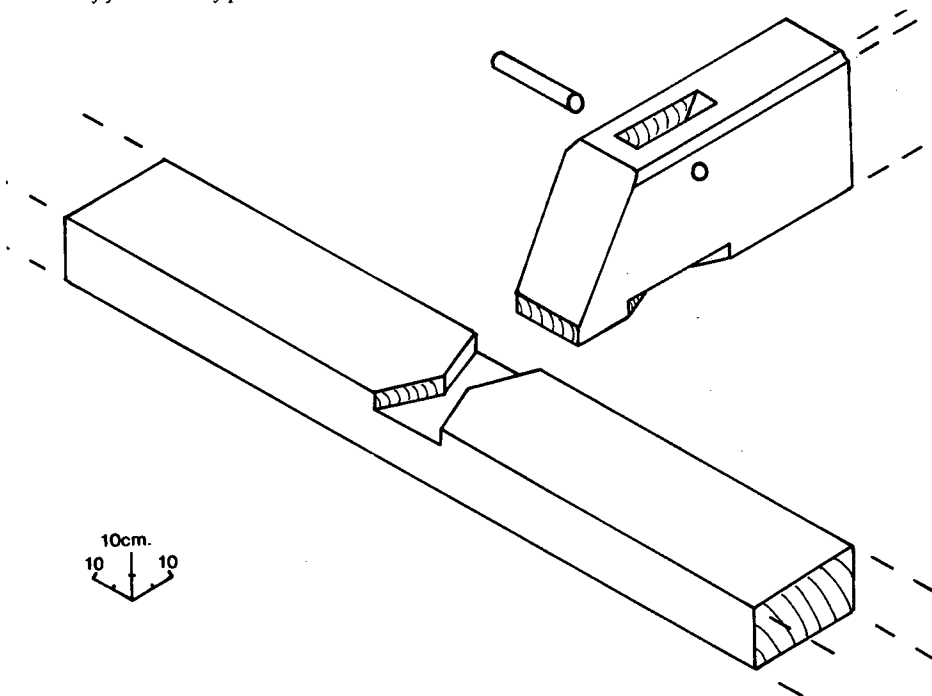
Dovetail joint between roof tie beam and wall plate.
